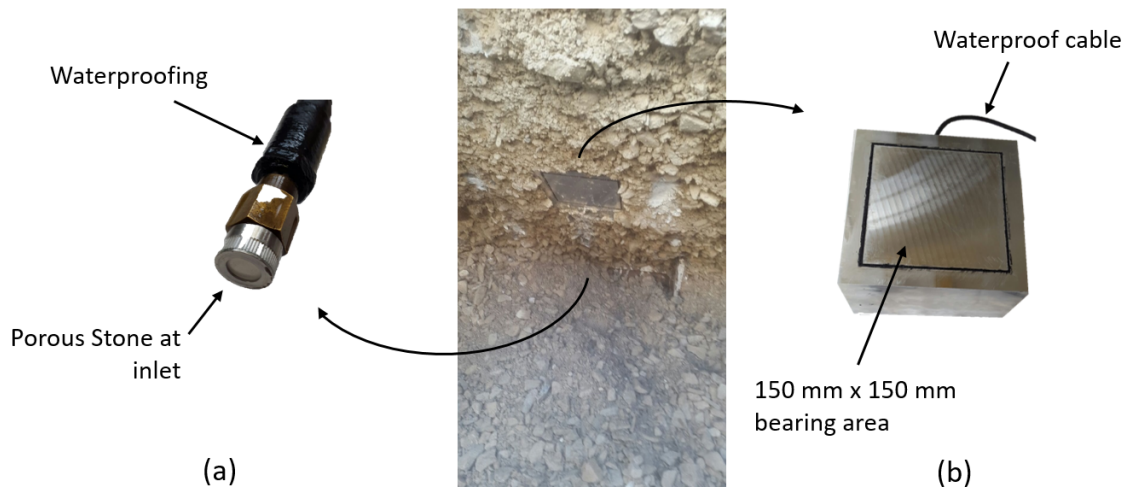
View at base of caisson wall (a) pressure transducer, (b) load cell.
